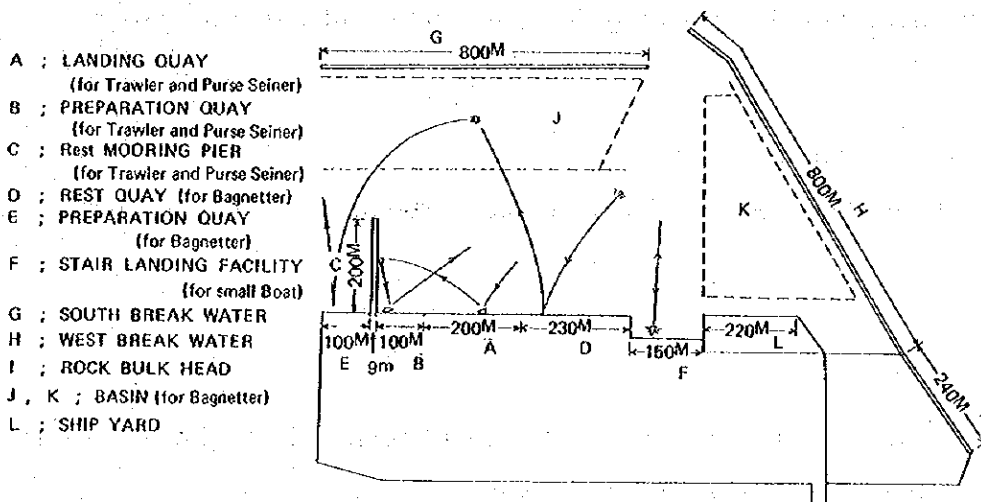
Hoilo Fishing Port Basic Facilities Layout and Utilization Diagram.
